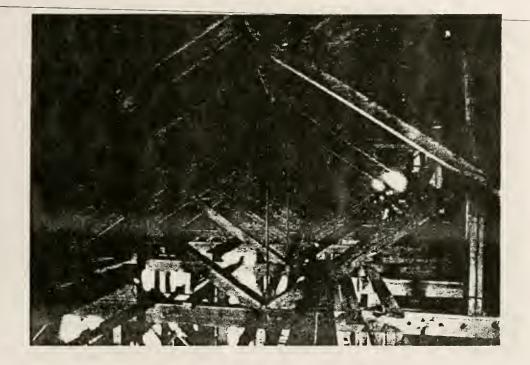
Revenue Mill (structure #34) interior view, looking north of the rod trusses over the stamp mill level.
